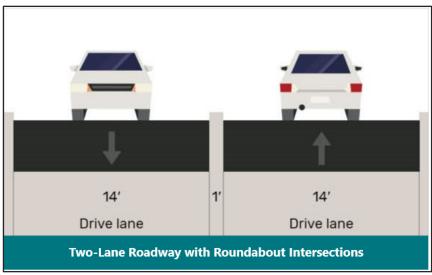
Two-Lane Section with Roundabouts Alternative (RB1).
